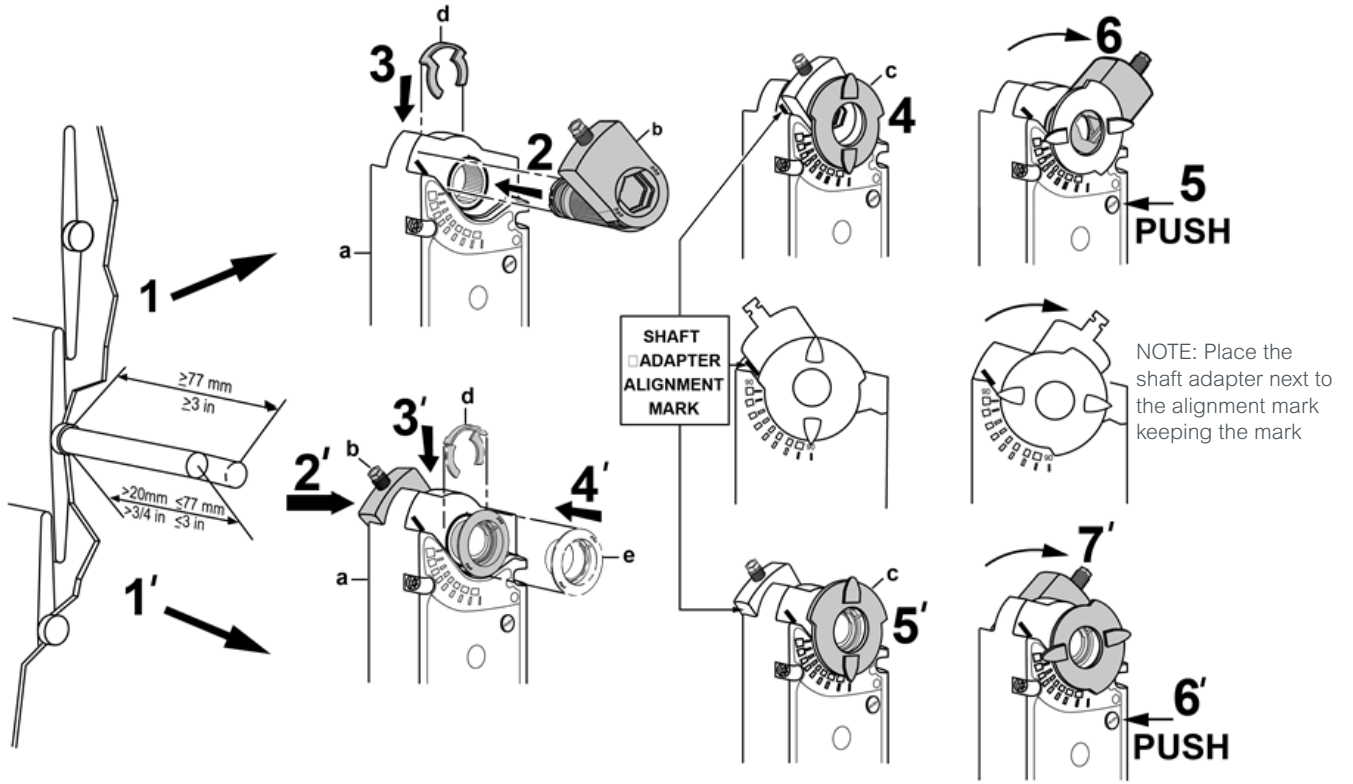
Shaft Adapter Placement for Counterclockwise Rotation on Short and Long Shafts.
